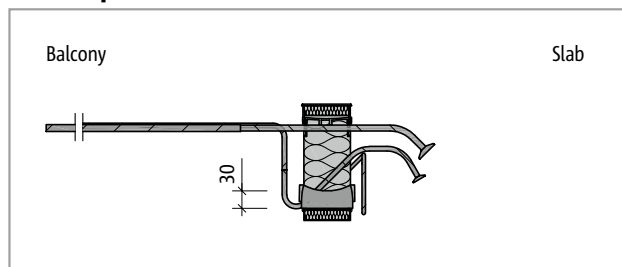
Schöck Isokorb® T type K-O-M1 to M3: Cross section of the product
